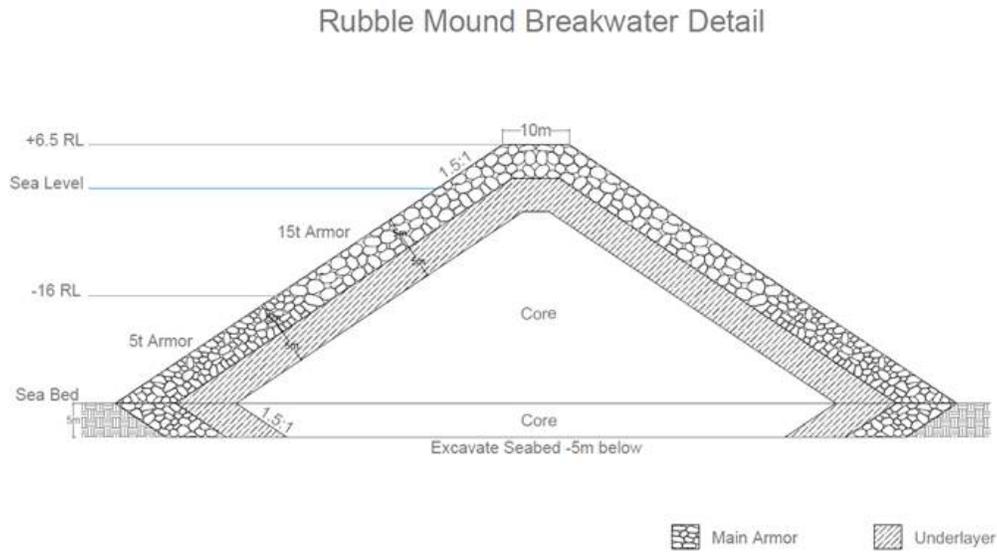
Typical Cross Section of the Breakwater Structures
